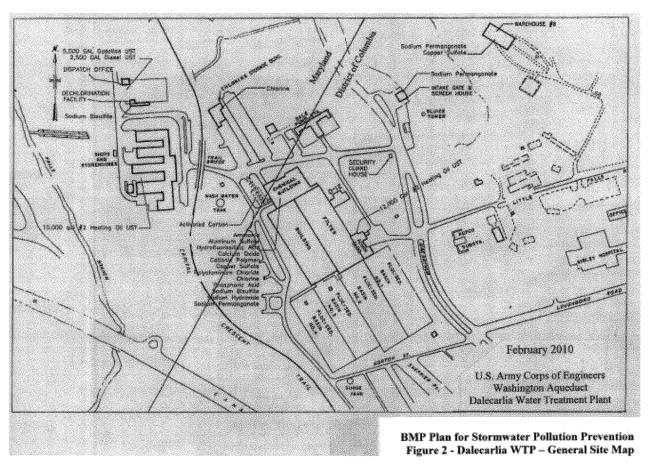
Dalecarlia Water Treatment Plant - General site plan.
